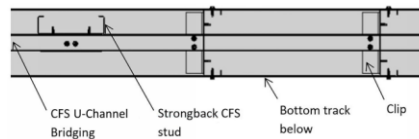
CFS stud-wall U-channel bridging—strongback anchorage (plan view)
